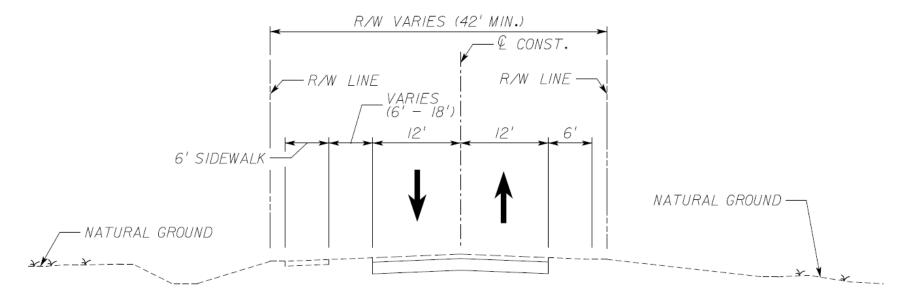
| Existing Typical Section – Segment 3 (Commercial Street to Stokes Street)
